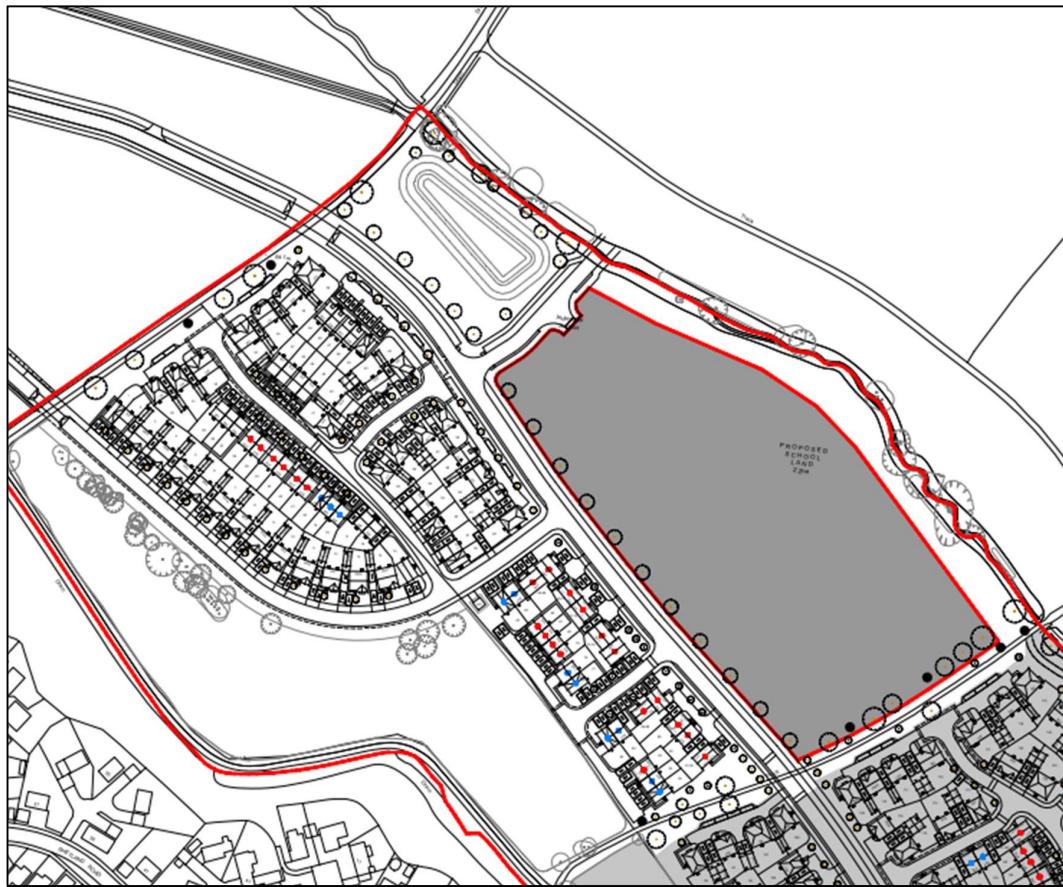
Site Layout Extract (Source: Bloor Homes Ref. EA232-PD-002)
